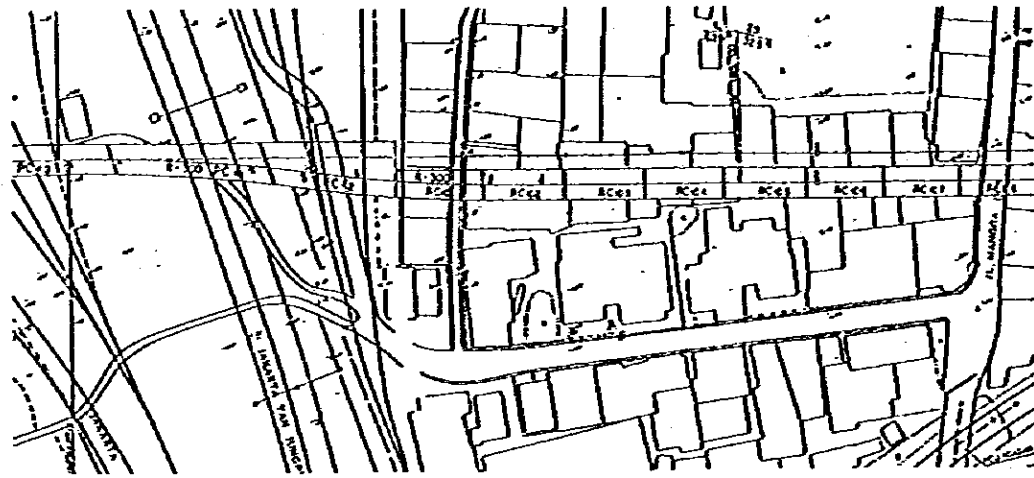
Proposed Plan of Temporary Ground Line (At Shifted Location)
